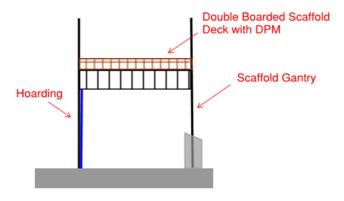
Typical Protected Pedestrian Tunnel (Not to Scale)
